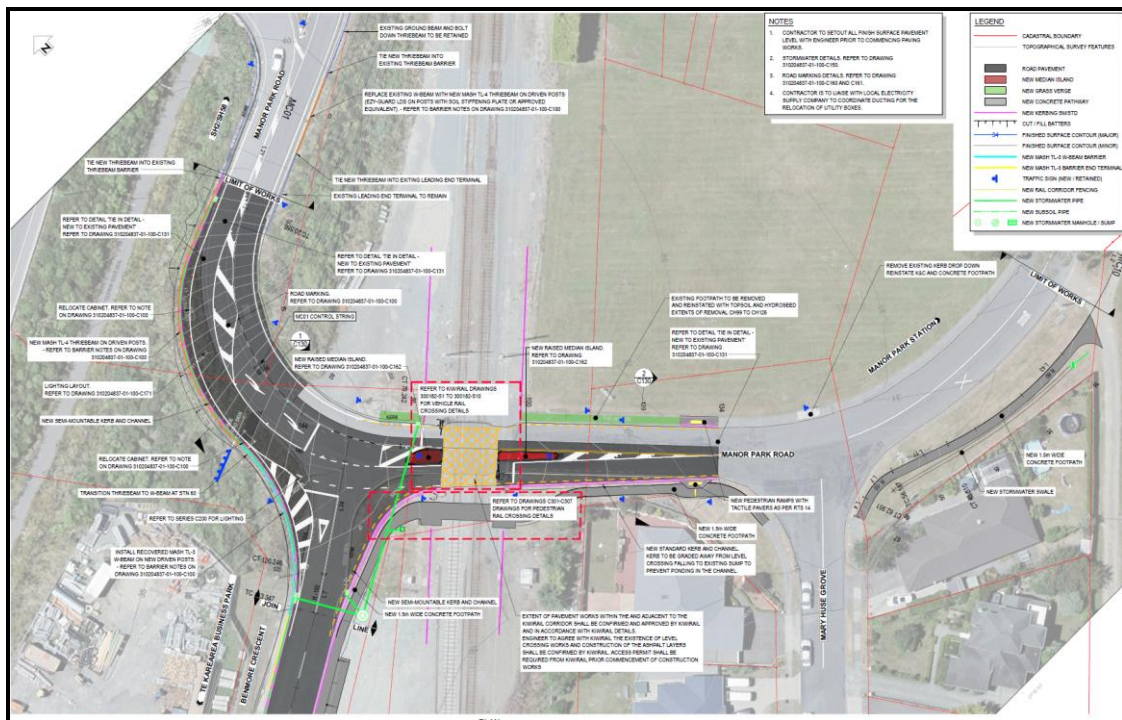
Proposed Benmore Crescent / Manor Park Road intersection upgrades
